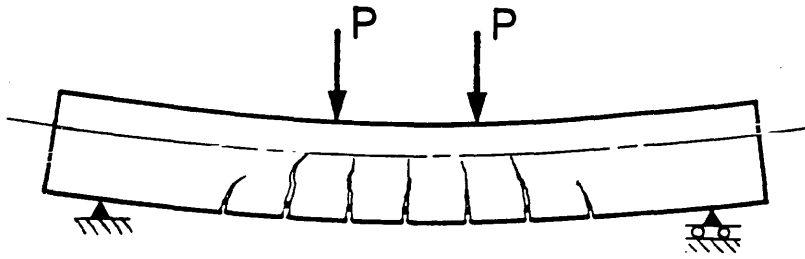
DEFORMATION OF A REINFORCED CONCRETE BEAM
